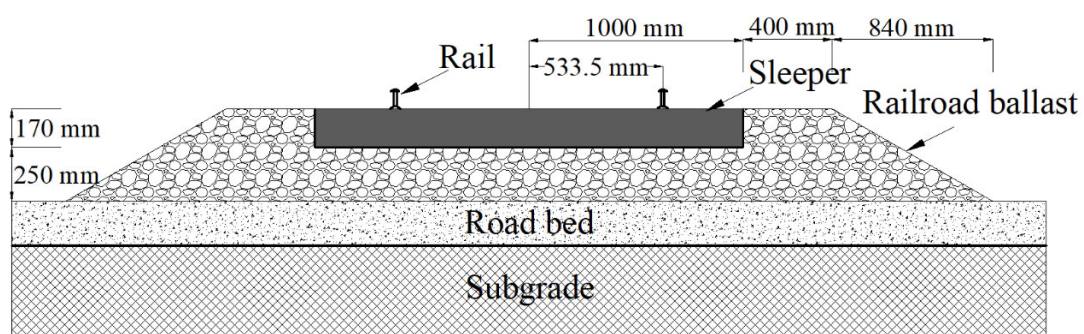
Schematic diagram of a typical ballasted track structure in Japan.
